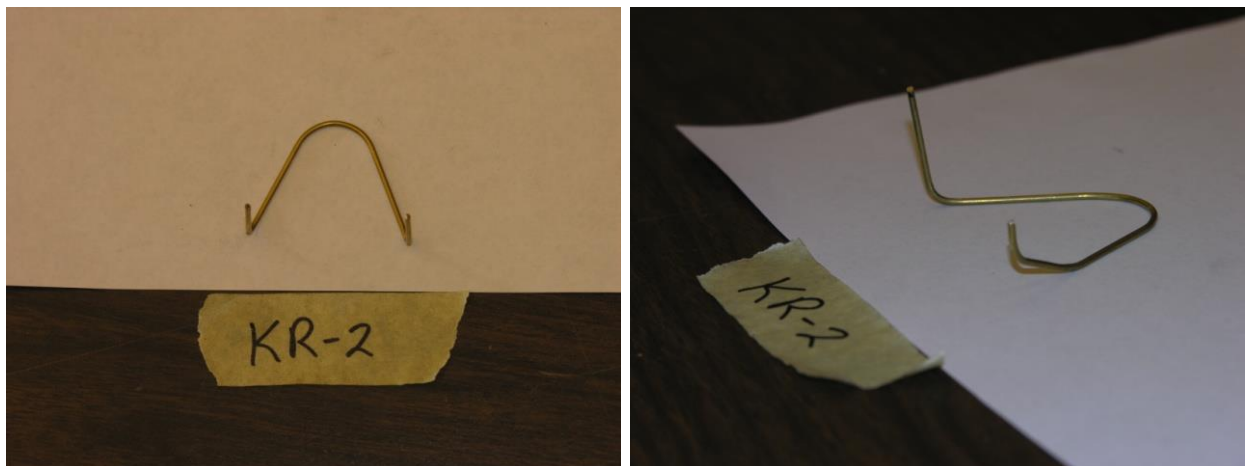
Pre-Test and Post-Test Photographs, Test No. KR-2
